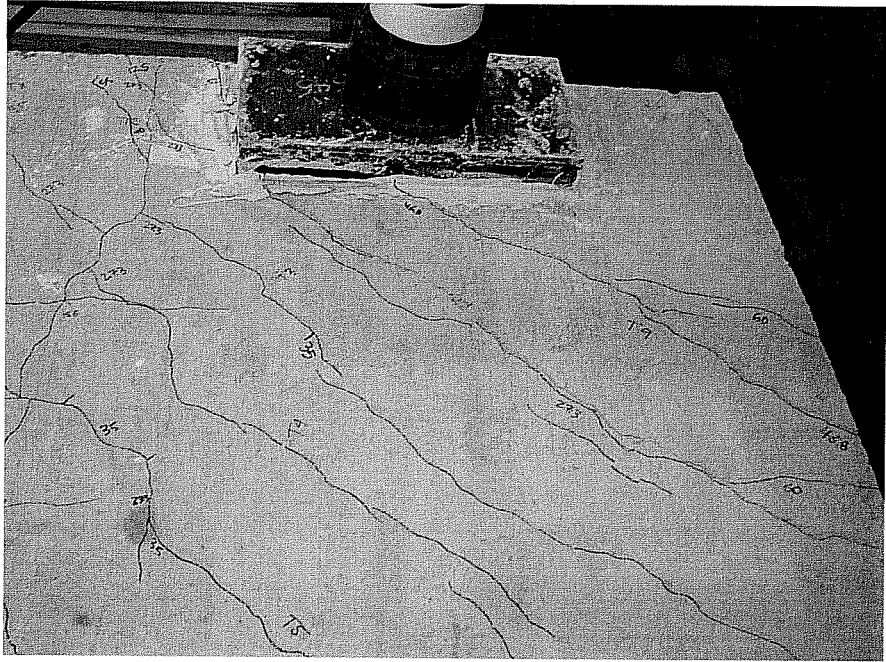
Failure of Overhang Test Area 2, top view, facing south
